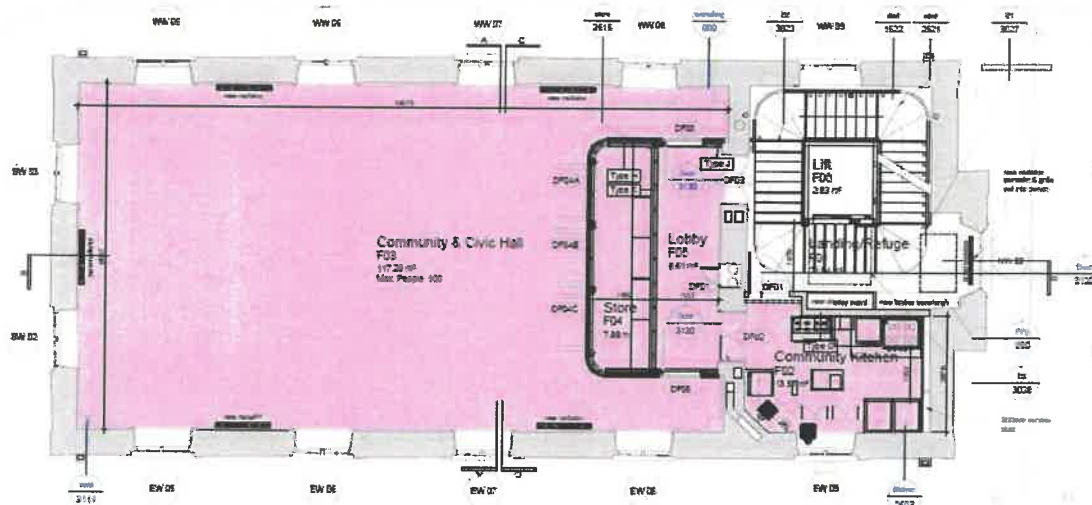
First Floor Extract from drg1054-C1502 courtesy of Haverstock
